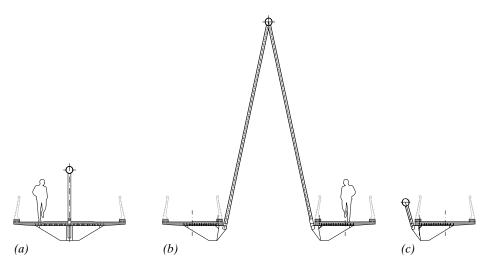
Cross sections. (a) Main span. (b) Division into two branches. (c) Ramp
